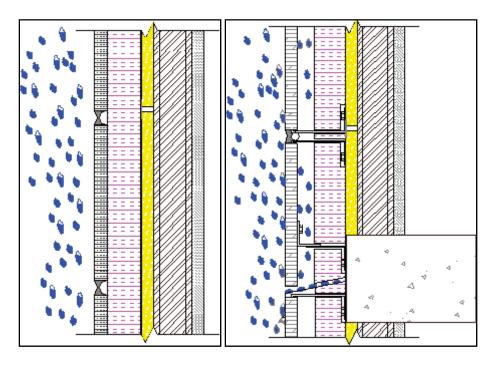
Left: Barrier Wall Diagram; Right: Cavity Wall Diagram
